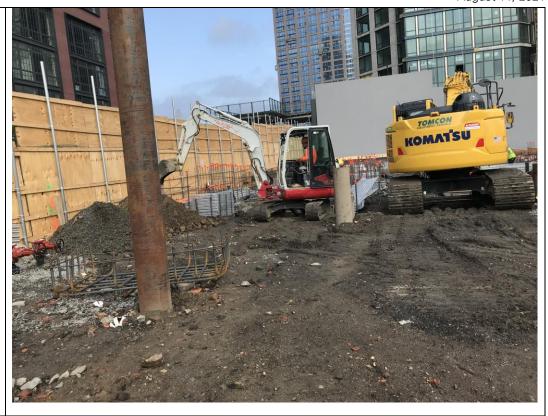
View of partially backfilled hotspot LB22 (facing west).
